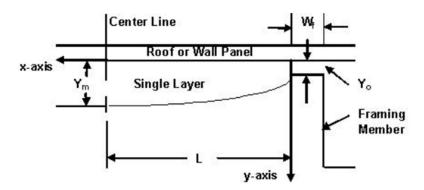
Geometry of single-layer fiberglass batt.
